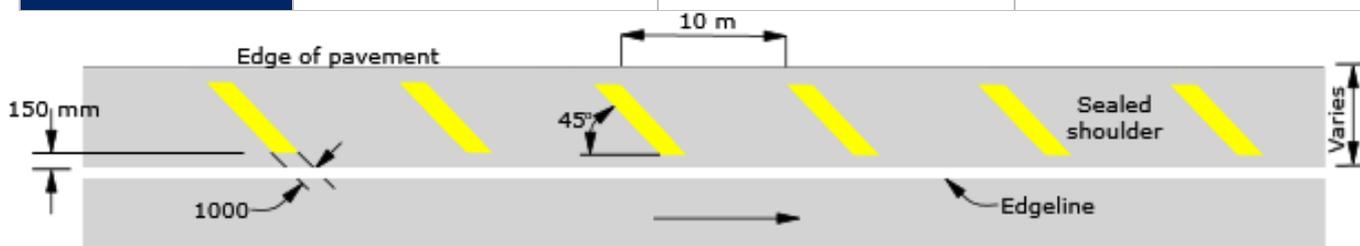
Required yellow linemarking and diagonal marking dimensions, spacing and angles
